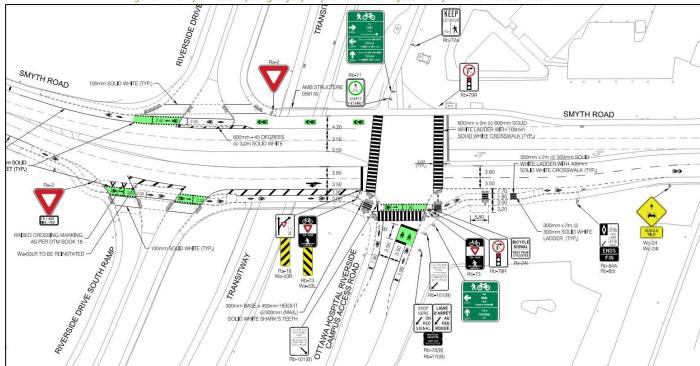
Smyth Road Cycling Safety Improvements Project – Smyth Road at Site Access
